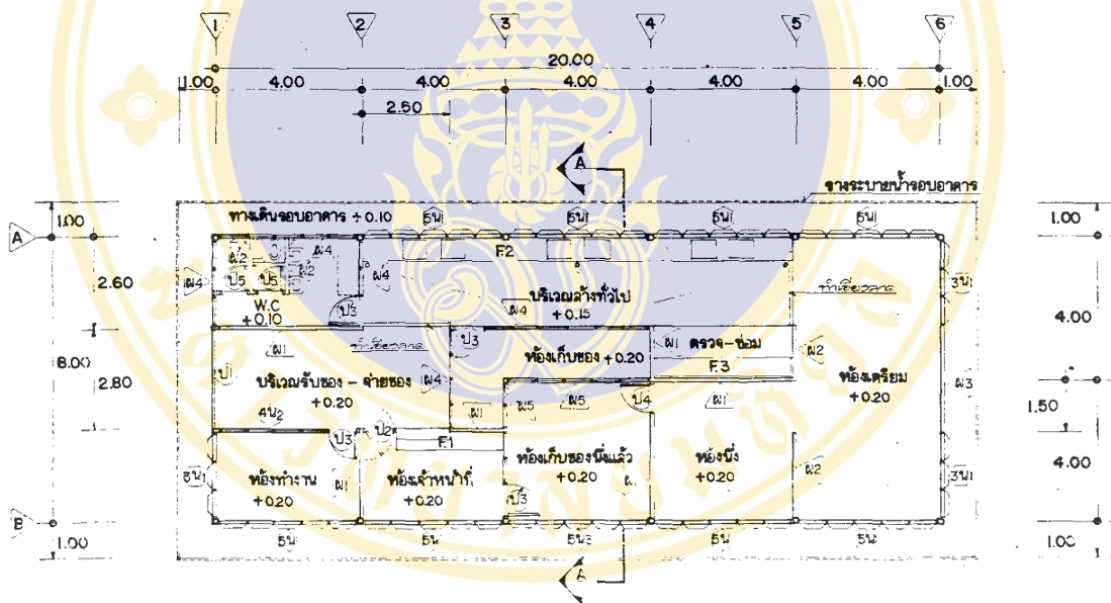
Floor plan of Central Supply Service Department (CSSD) building
